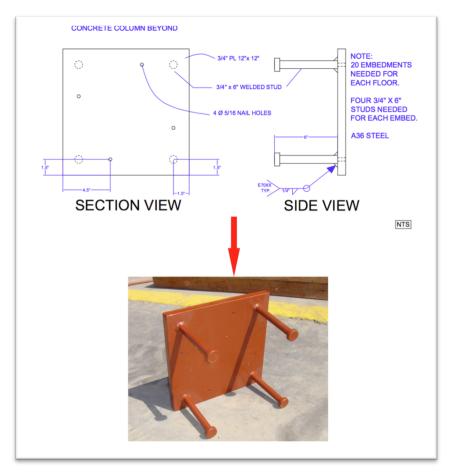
Fabrication of a steel embed from initial drawing to final product. (Drawing by Cecilia Luu)
